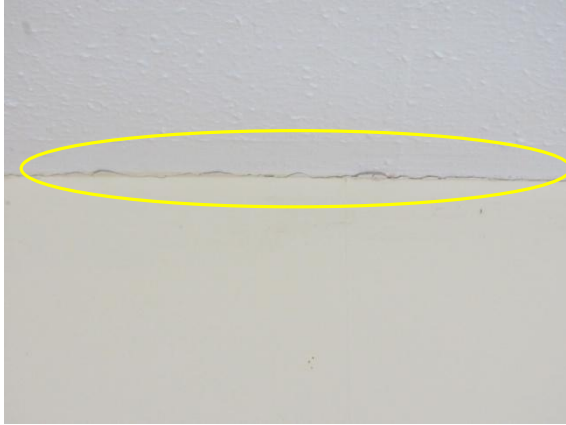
Hairline Cracking along Wall and Ceiling Lining Joint
